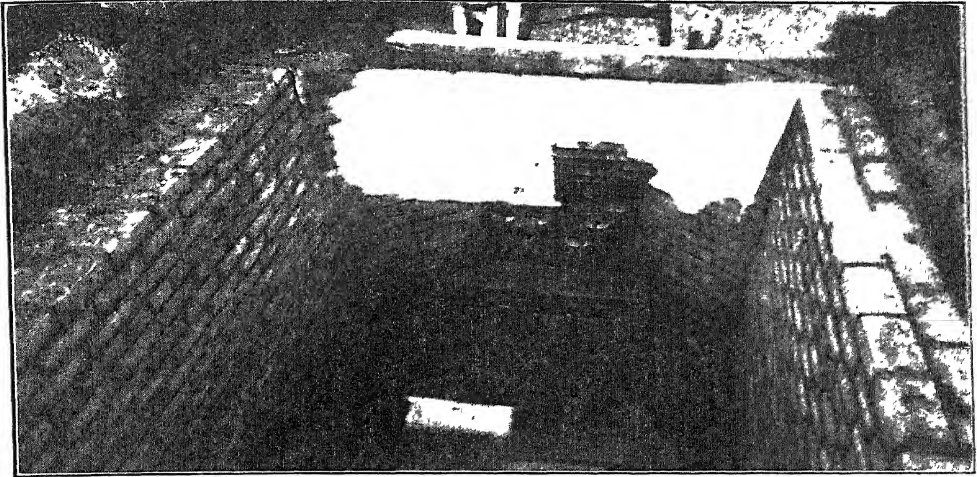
Underground manhole construction—brick walls, showing conduit entrance
